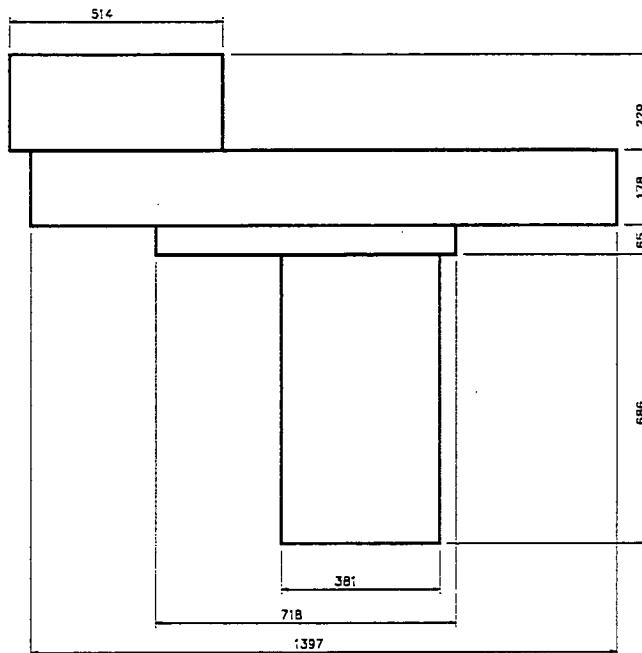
Exterior Beam Cross-Section for Grillage Analysis
